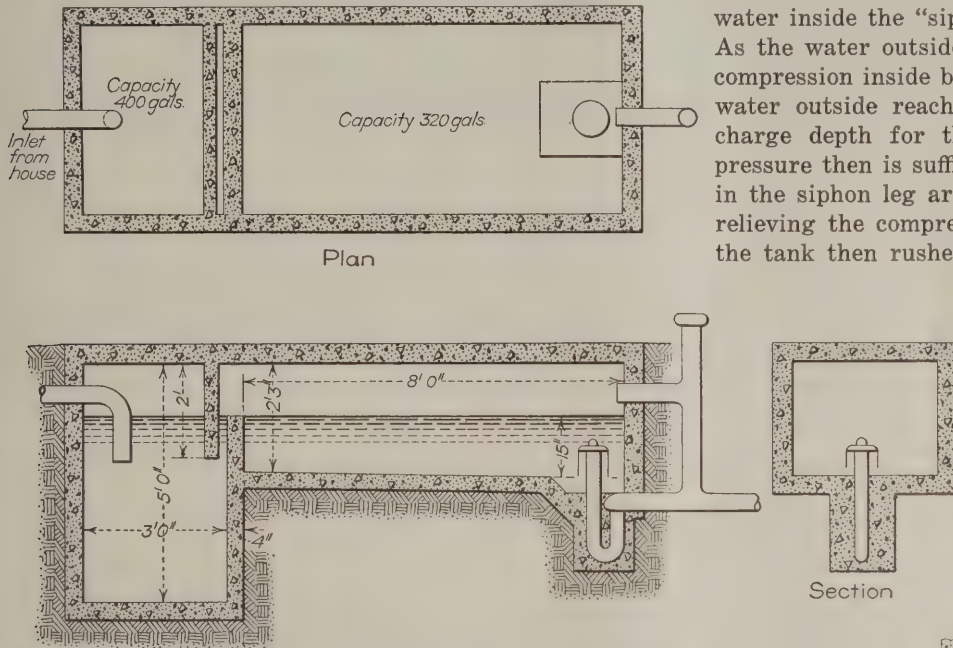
Plan with Longitudinal and Cross Sections of Double Chamber Septic Tank for a Family of Six People, Suitable to Conditions Where Outlet Fall Is Difficult to Obtain—Scale 1/4 In. to the Foot
